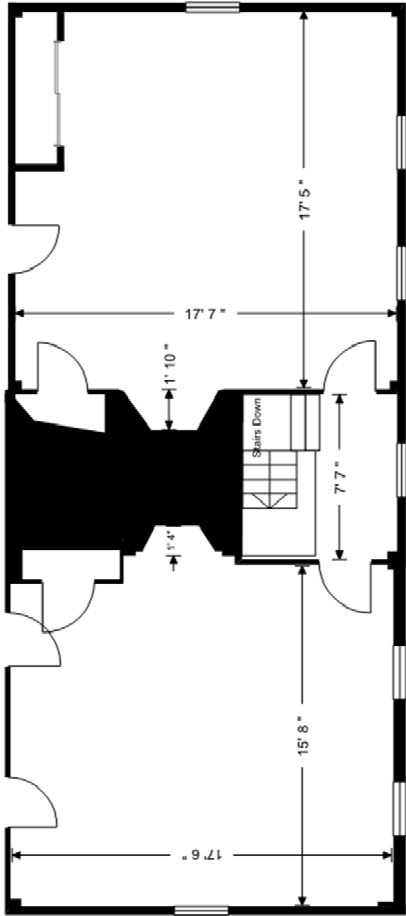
Current configuration of the rooms that comprised the ground floor of the Thomas Kilham House, as expanded in 1696.¹⁰³
